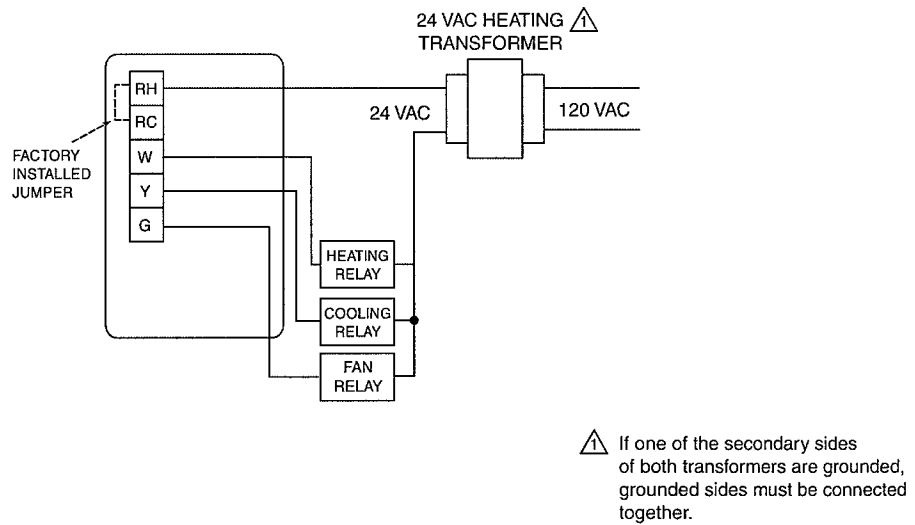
Typical T205 Wiring to Heating/Cooling System With Single Transformer.
